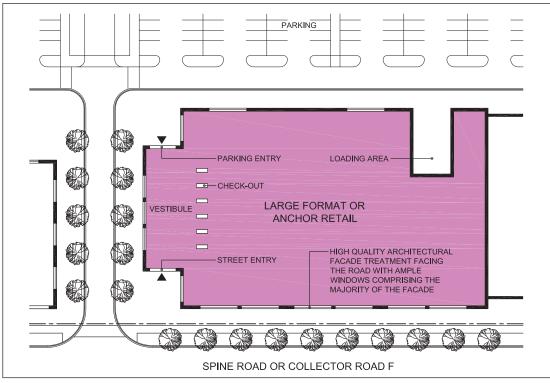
Conceptual plan depicting Anchor with Vestibule scenario.
